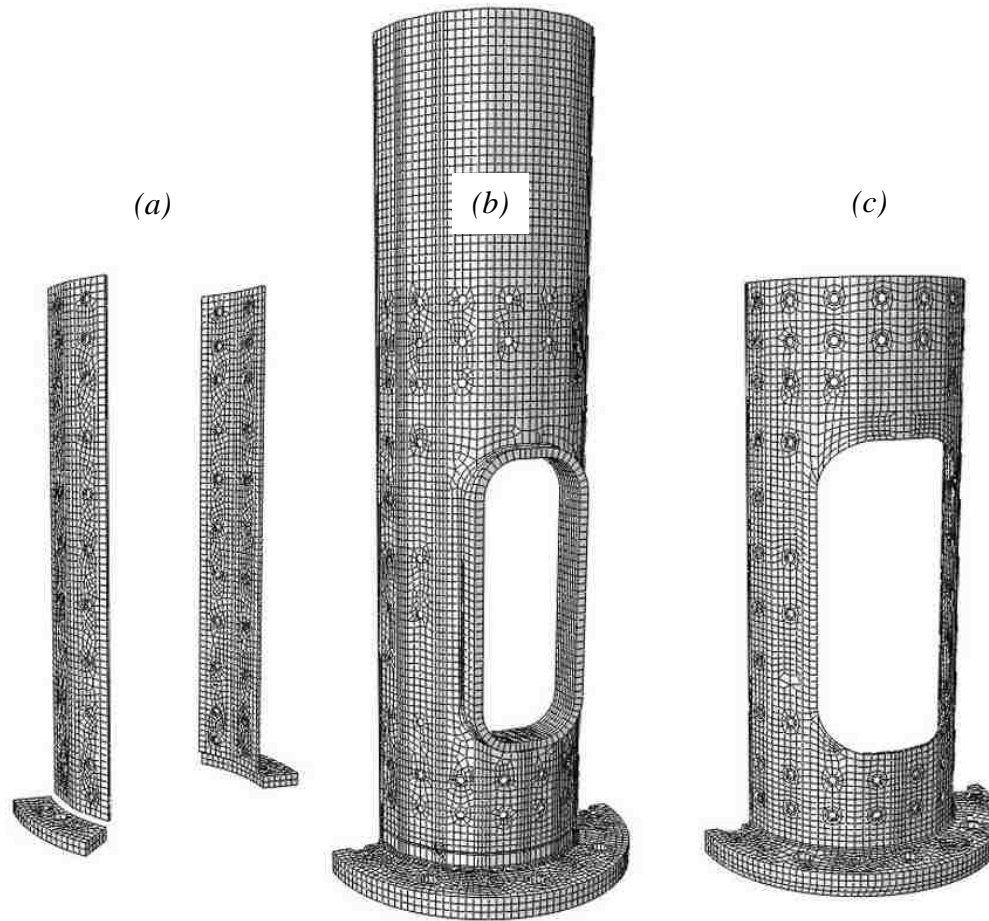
Front side exploded view of Model 1: *a*, splice plates; *b*, retrofitted pole; *c*, retrofit jacket.
